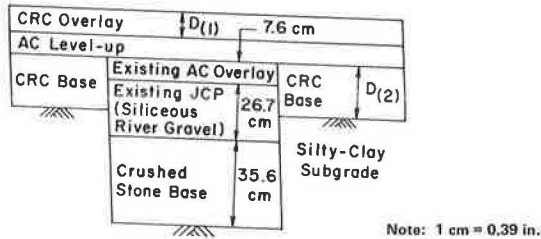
Cross section of pavement structure on I-35 south of interchange after overlay construction.
